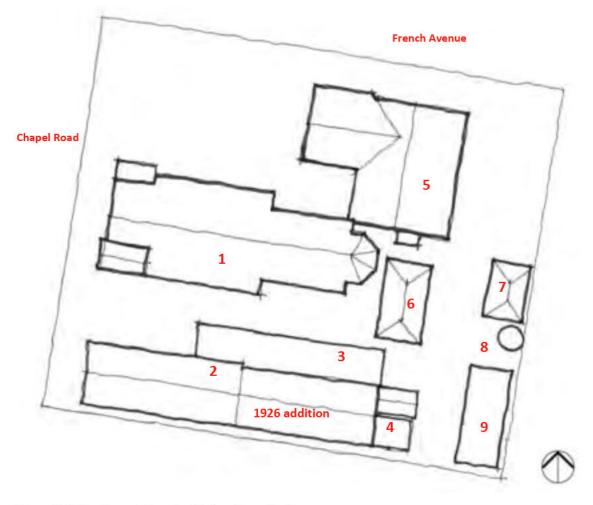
| Site plan - not to scale. [Hericon Consulting]
